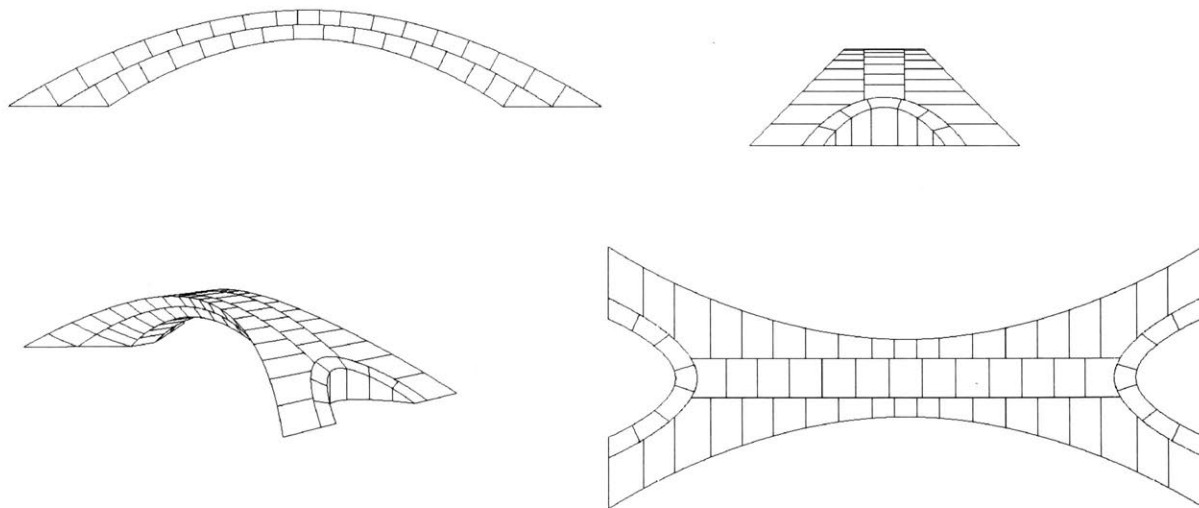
Voussoir cuts of the bridge. Shown from left to right, top to bottom: (a) elevation view (b) side profile (c) isometric view (d) plan view.
